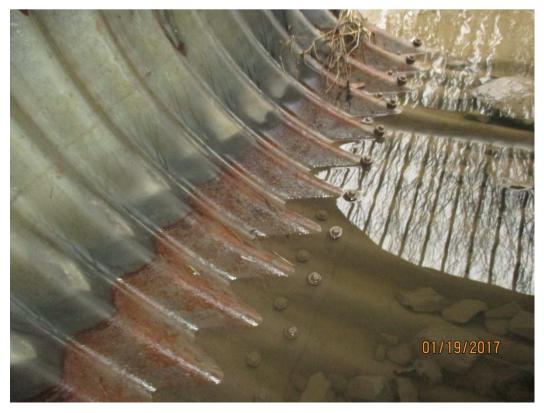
Corrosion of Culvert Invert near Inlet
